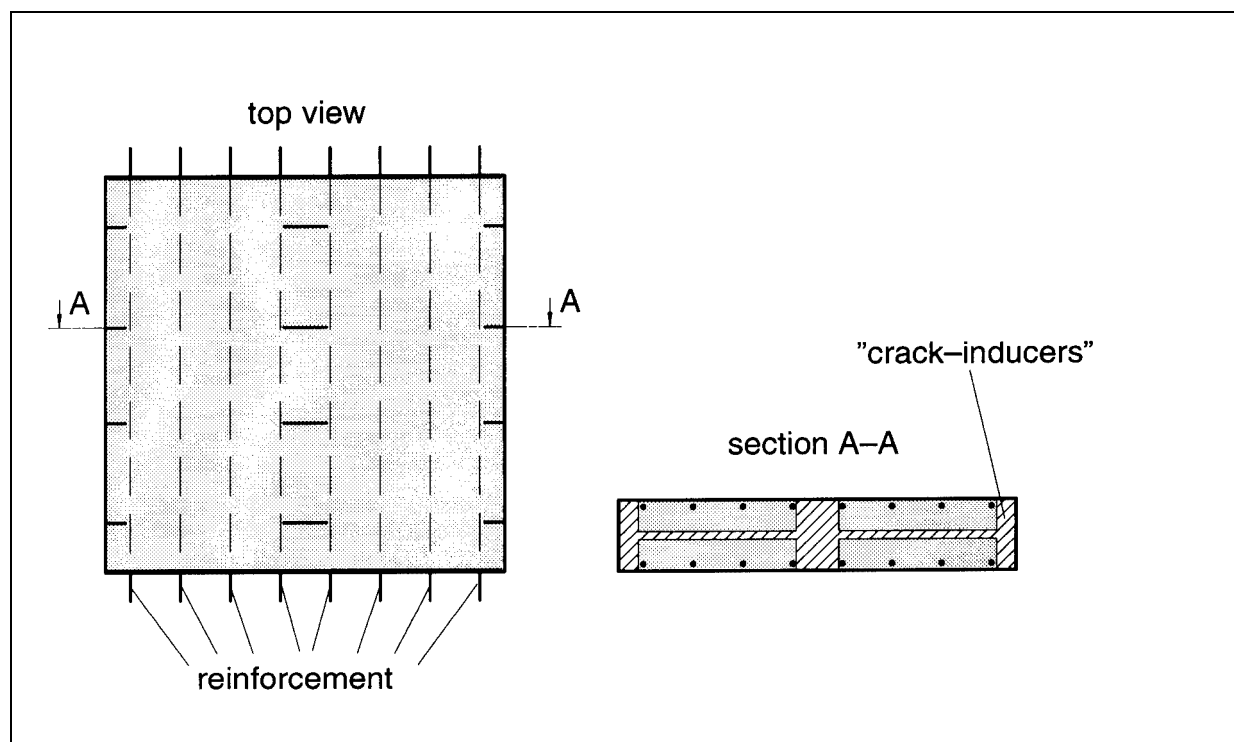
Example of a test member for plastic anchors tested in cracked concrete
